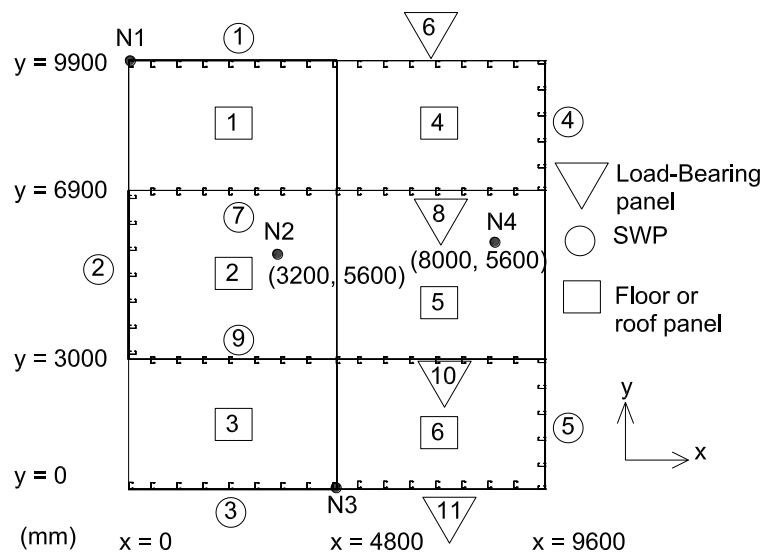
Typical floor plan and element illustration of the three-storey CFS building
